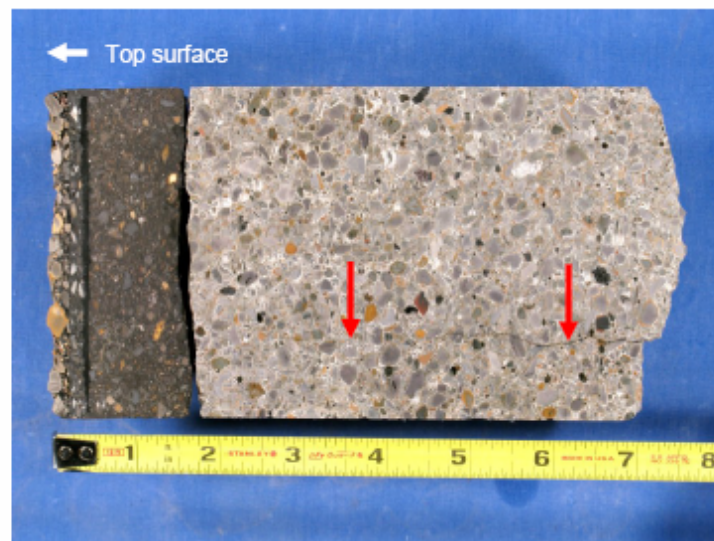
Cut and lapped cross-section of Core C2S3 showing general appearance of the topping and the concrete. Arrows indicate a vertical crack in the concrete. Top surface is to the left. Scale is marked in inches.
